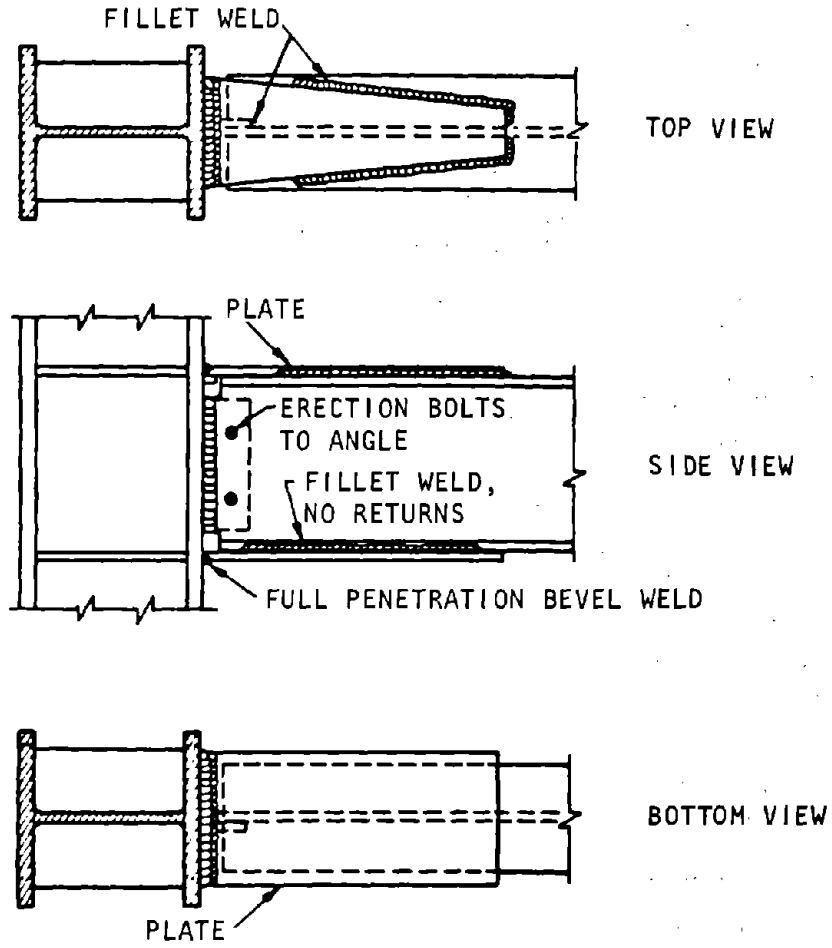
Alternative Beam-Column Connection, Type II (Popov-Pinkney, 1968)
